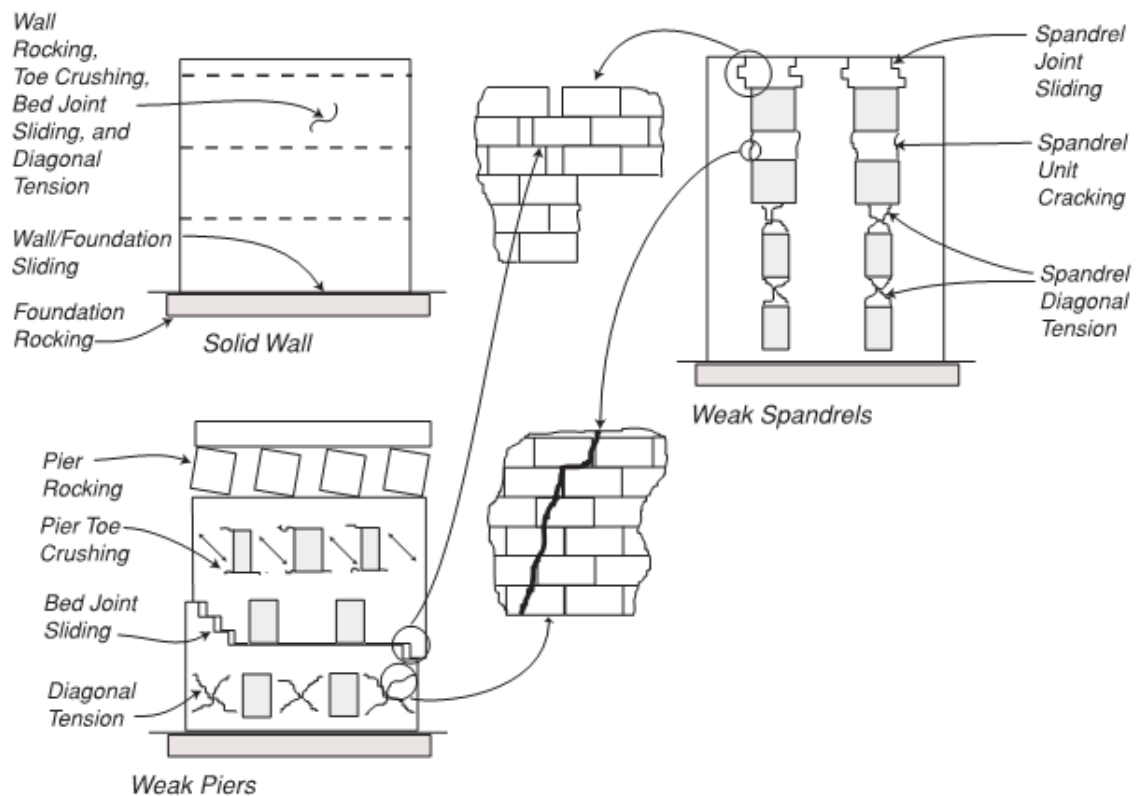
In-plane failure modes of URM wall (FEMA 306, 1998)
